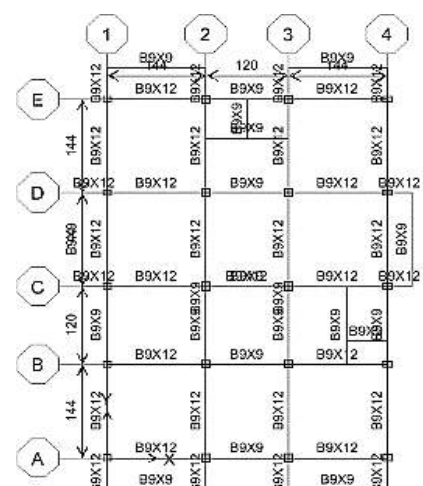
Roof beam section plan of proposed building for T-1 (in)
